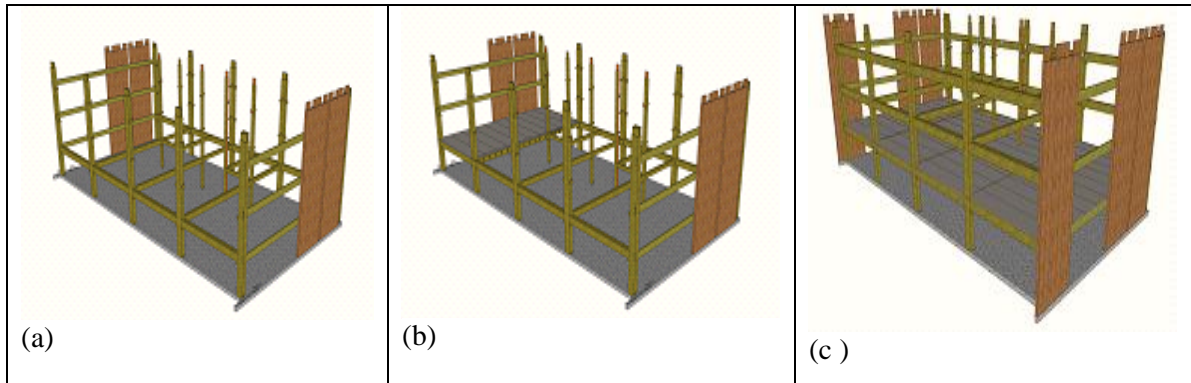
(a) Construction of first three storey walls, end frames, columns and beams up to level two. (b) Placed TCC floor panels begin at 1st bay Level Two (c) All seismic beams installed, end walls placed
